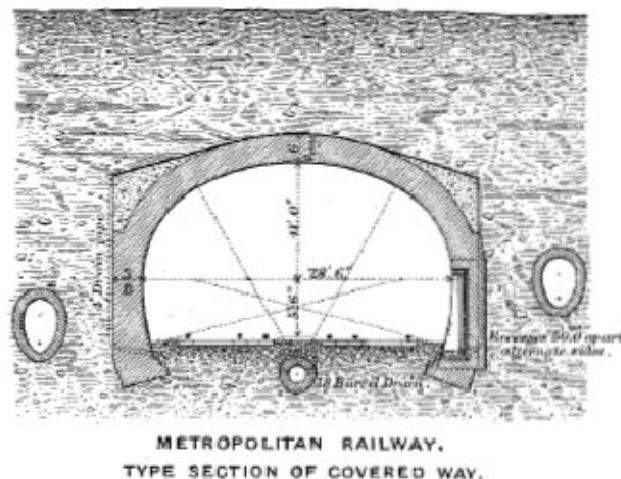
Drawing showing assumed foundation construction (note this does not show the second tunnel or Lighthouse building over
